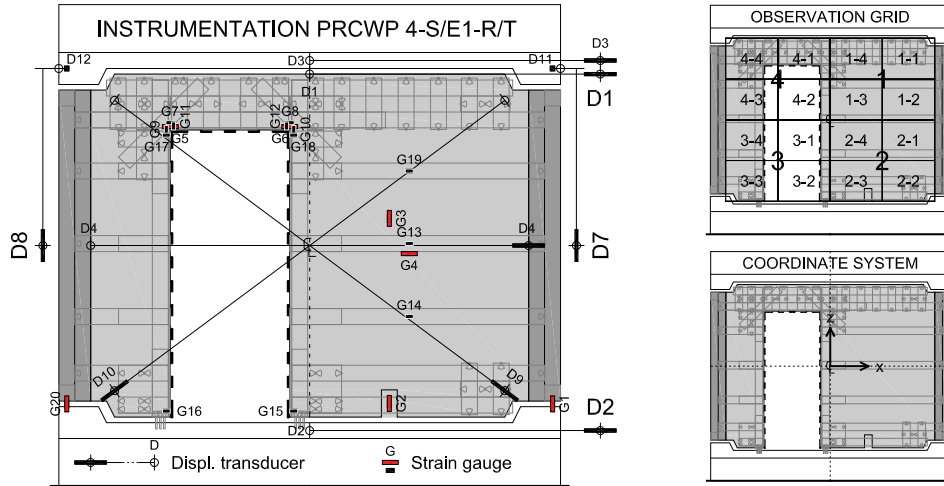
Instrumentation layout of specimen PRCWP 4-S/E1-R/T
